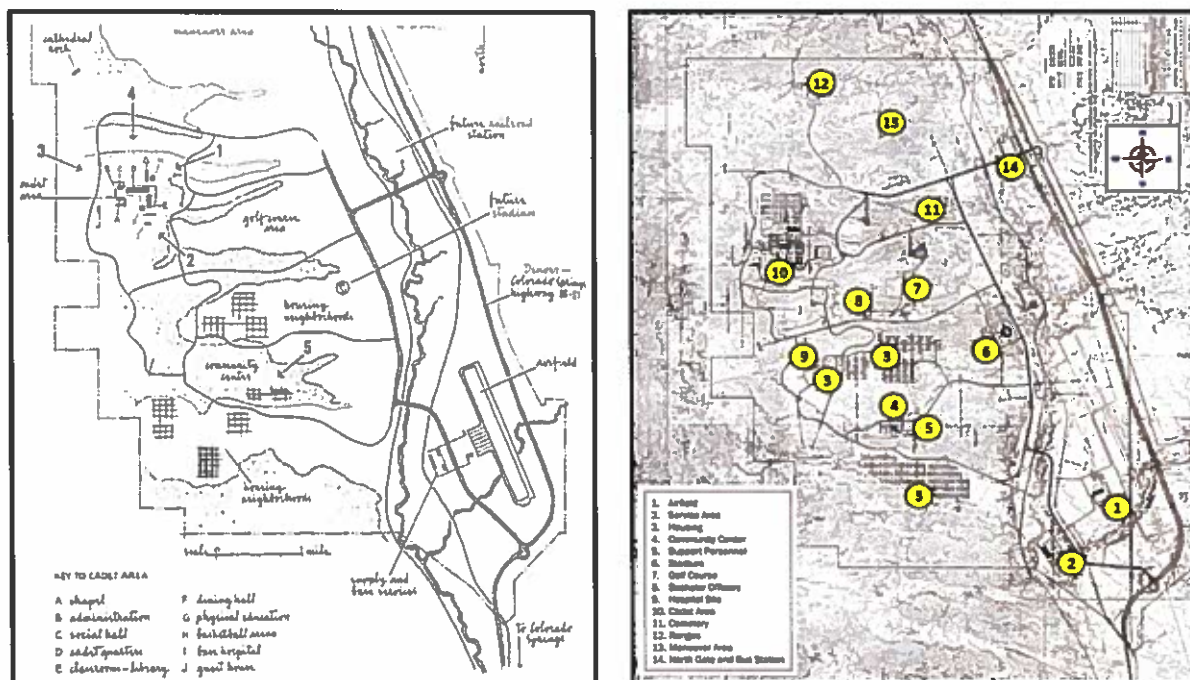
(Left) E.A. Bennett's June 1955 illustration of the proposed USAFA site plan. (Right) SOM's 1956 revised Master Plan.
